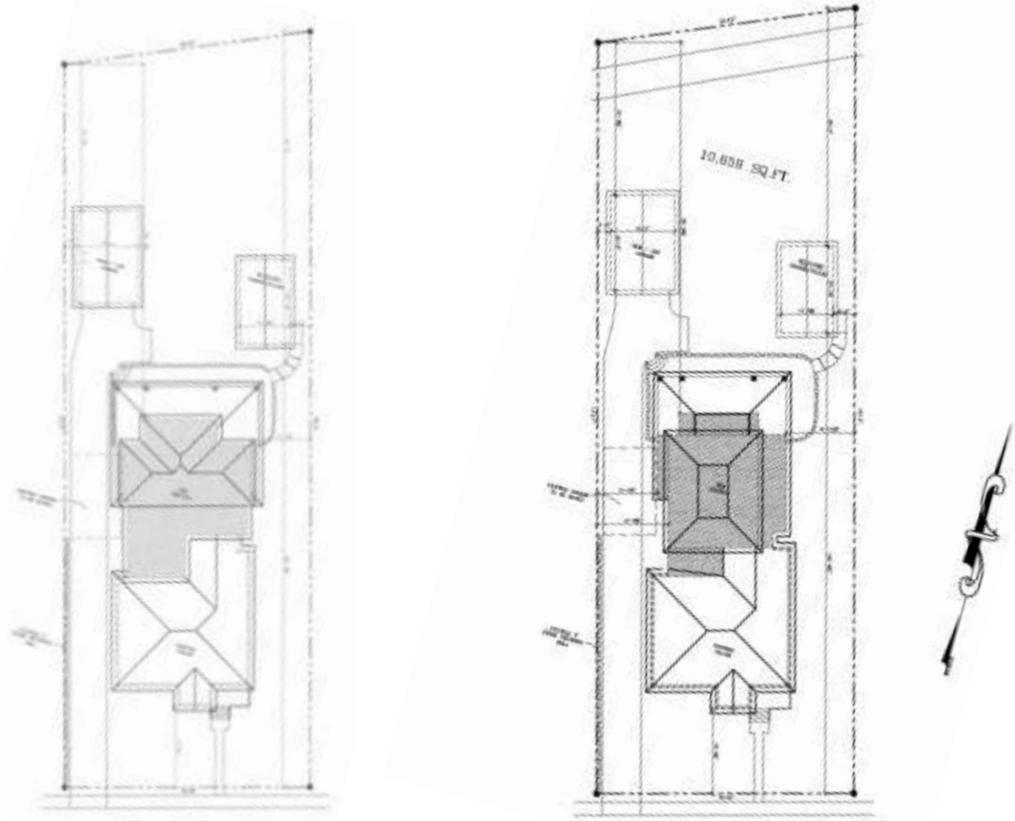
July 2<sup>nd</sup>, 2014 (left) and Proposed Site Plans (right). Not to scale.
